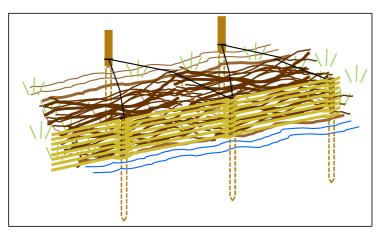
Securing brash, brash bundles, small trees or large wood to the bank face with wooden stakes or reinforced bar, stainless steel cabling and willow spiling
